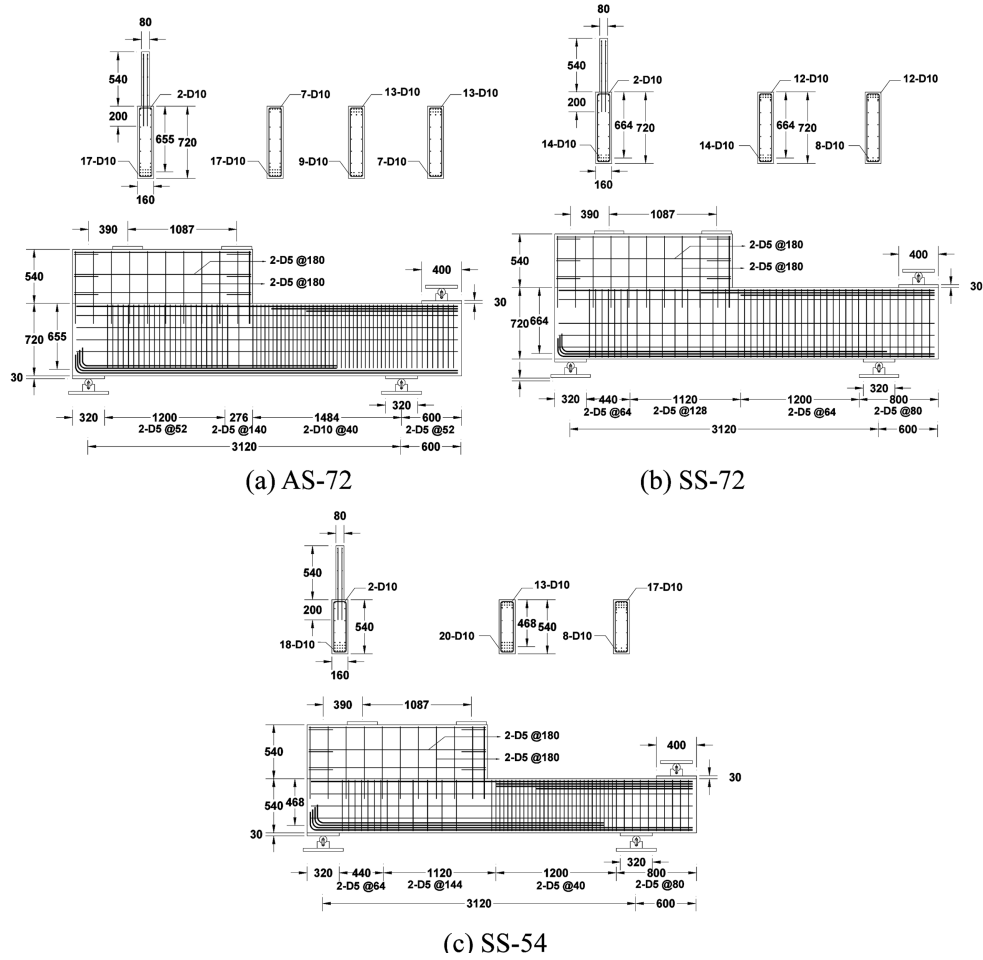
Details of specimens (scale: 1/2.5, unit: mm)
